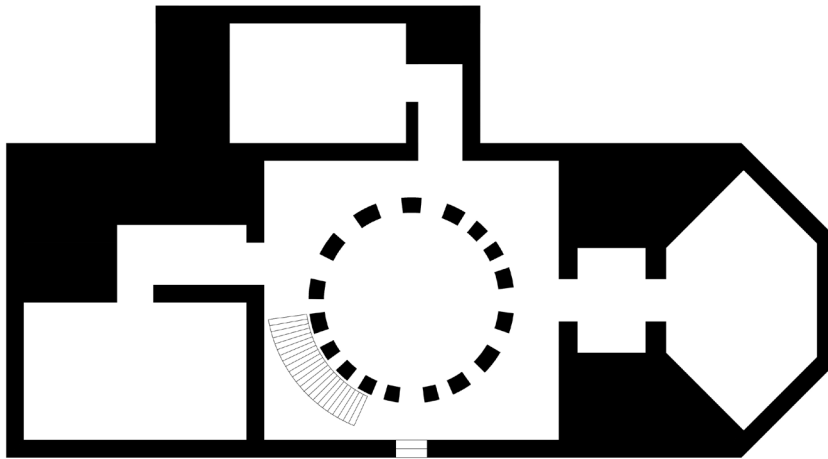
Kuehn Malvezzi, *House of One*; floor plan diagram depicting sacred spaces and Central Hall.
